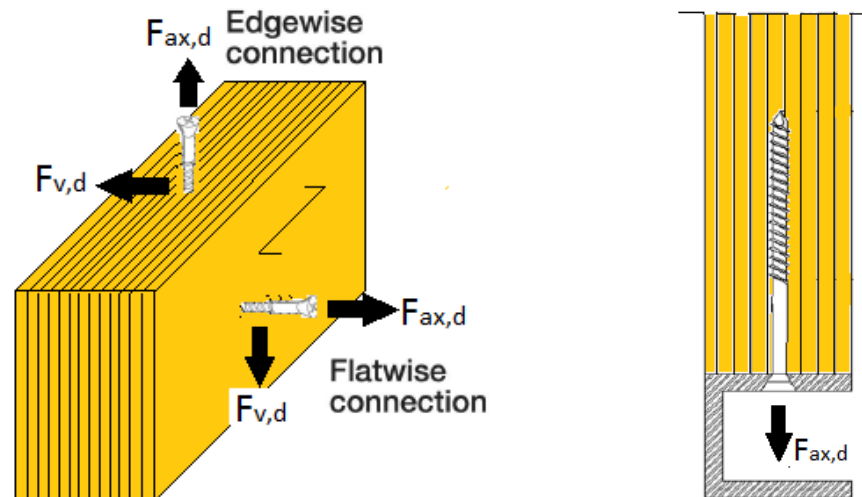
Suspended connections in LVL structures (Source: Metsä Wood 2013b p. 4, 27)
